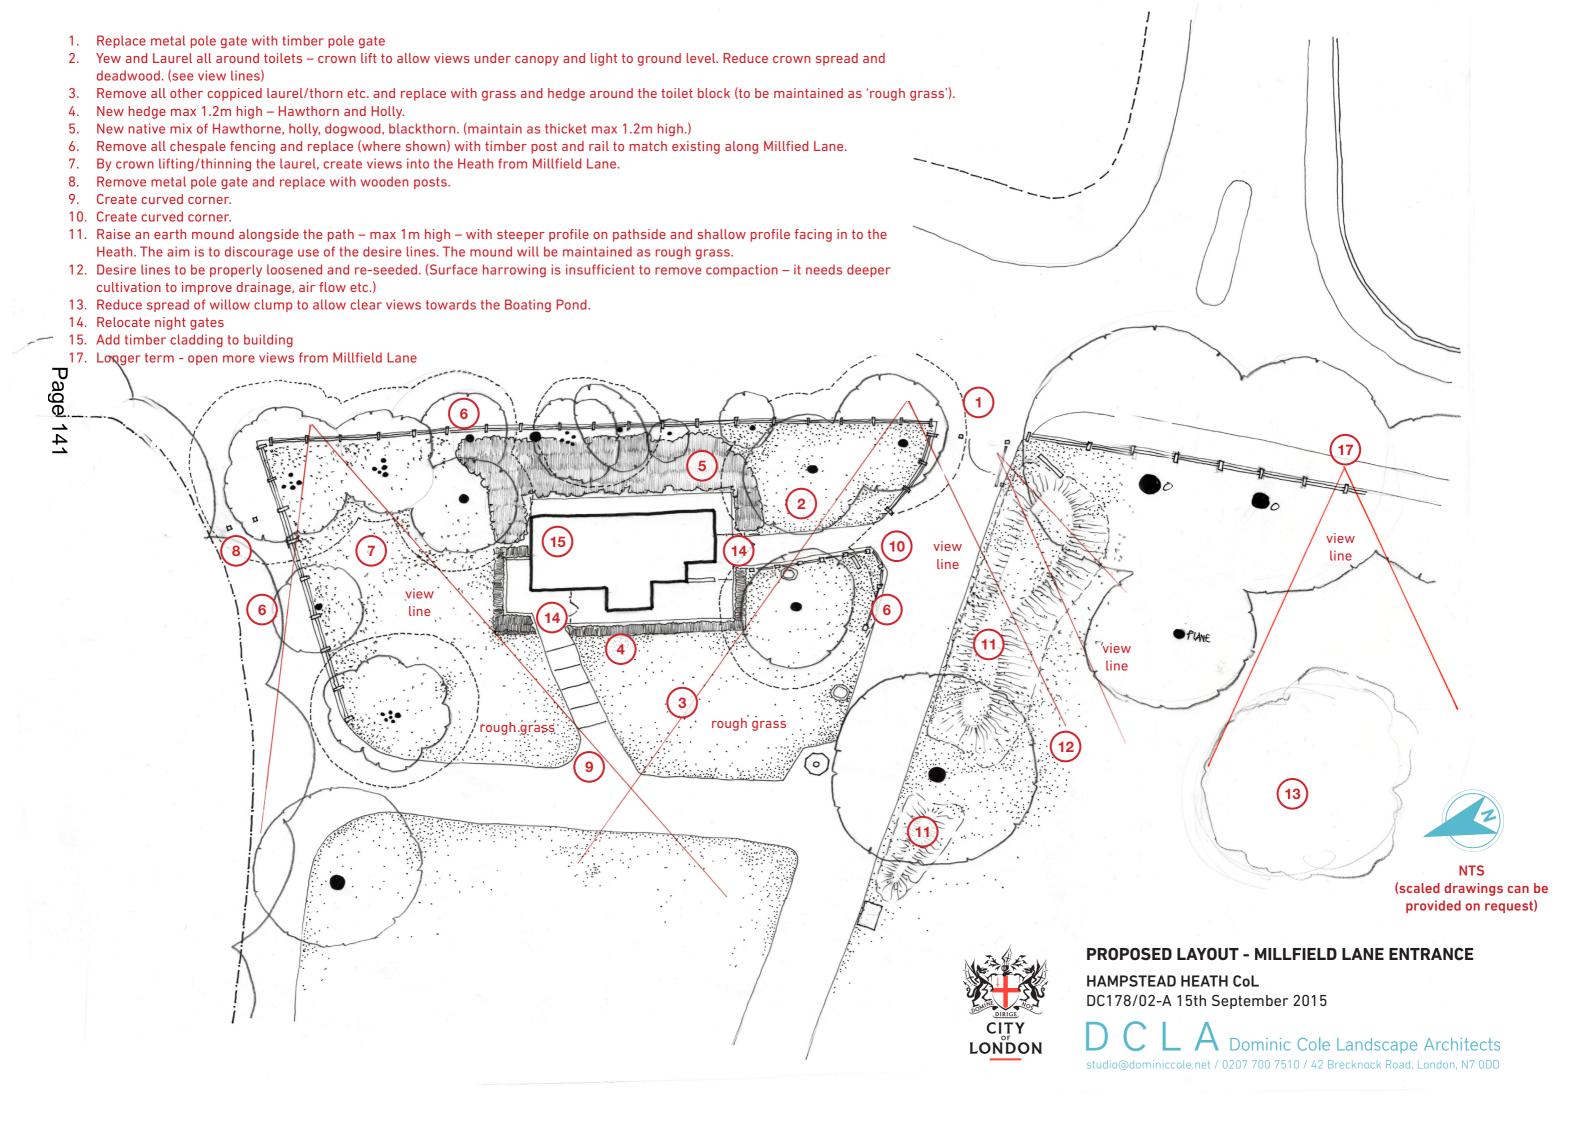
Reduce spread of willow clump to create views towards Pond (Note 13, appendix 3 - proposed layout).
